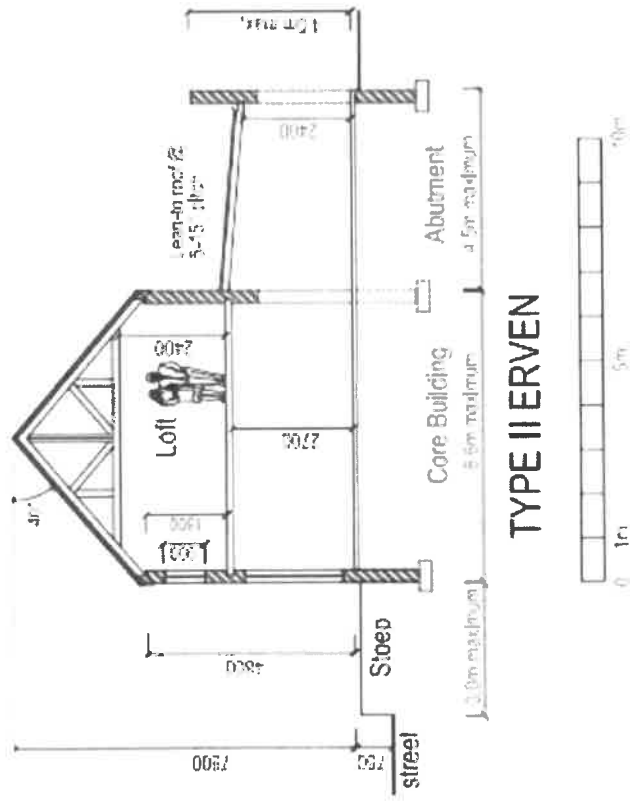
Sections illustrating the maximum and minimum dimensions for buildings on Type II erven
